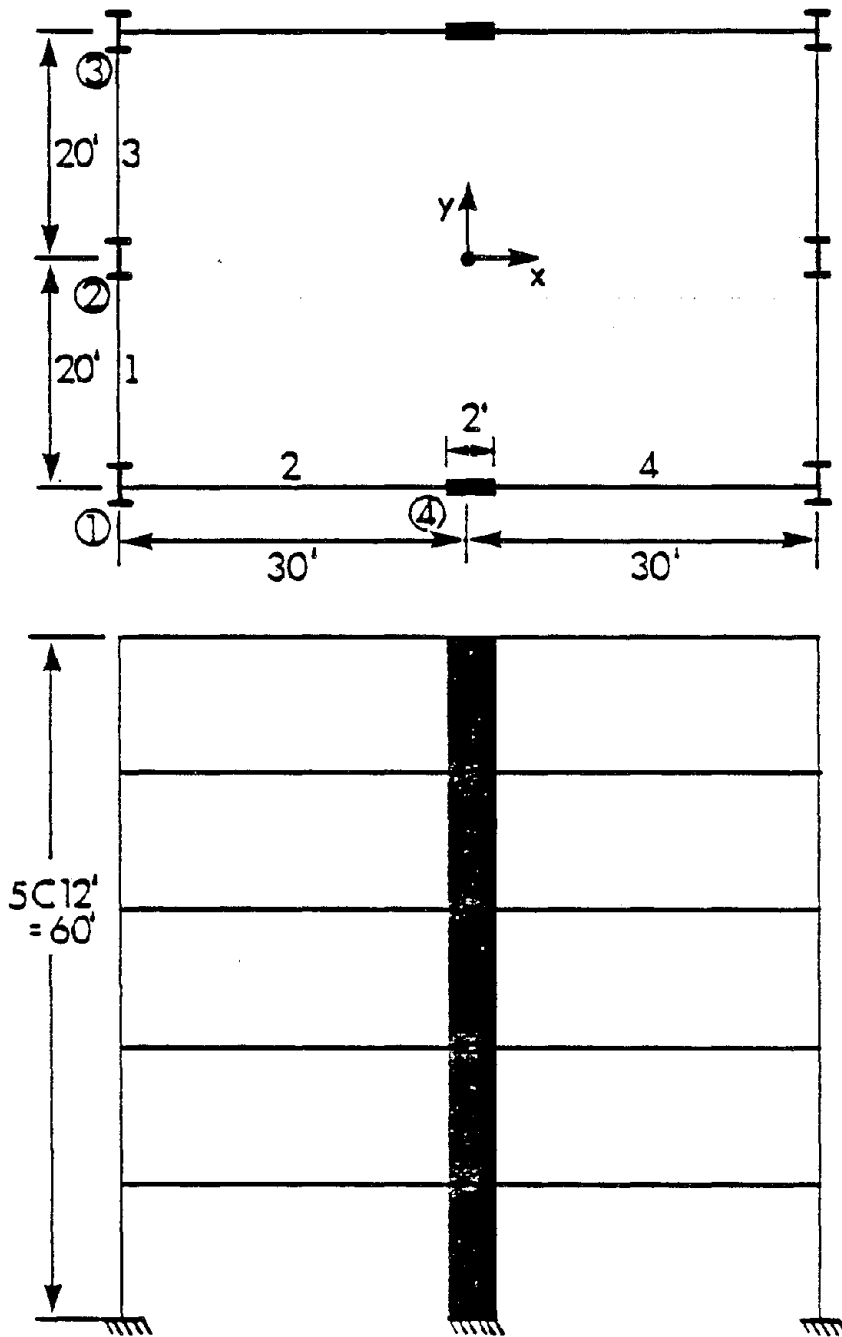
Five Story Steel and Concrete Structure (1' = .305m)
